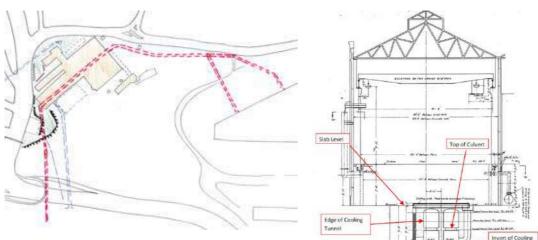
Inlet canal is part of the coolant water system shown red on the plan above (Design 5).
